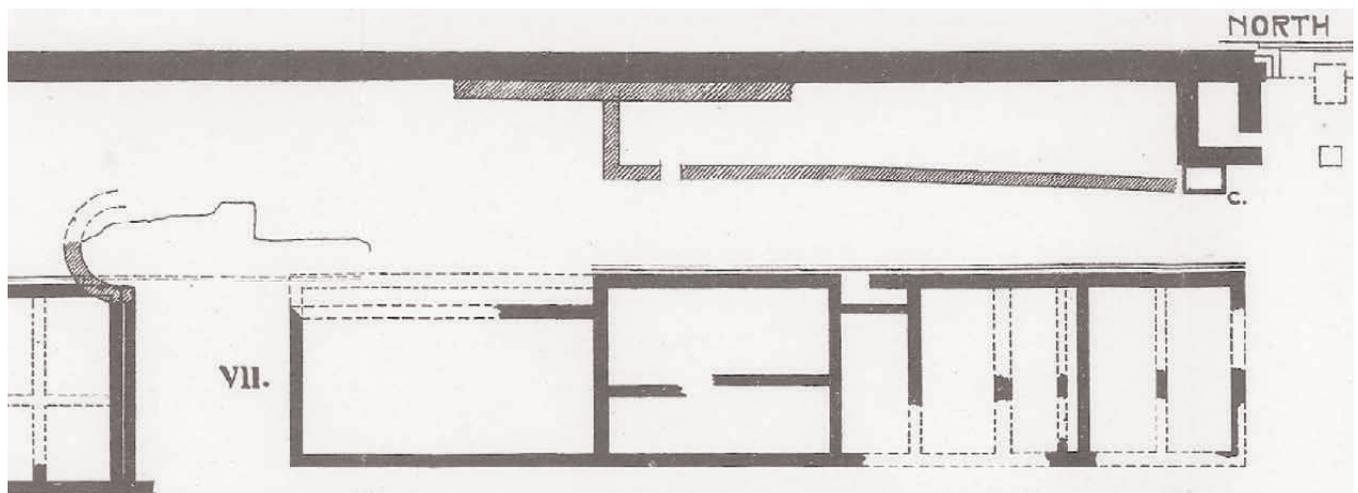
Building VII (extract from the 1898 excavation plan).
